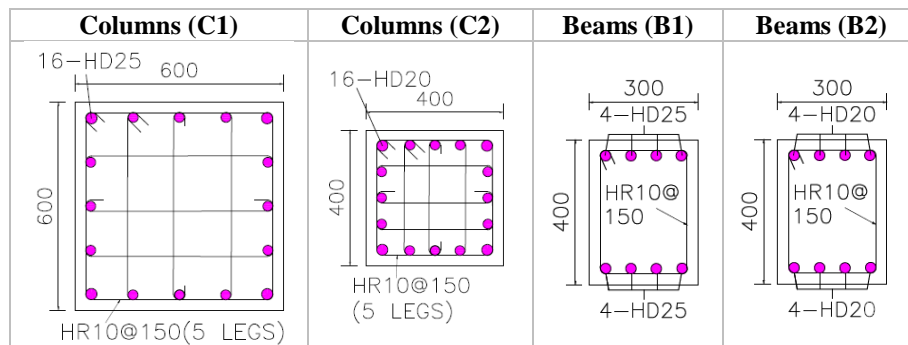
Cross sectional layout of the columns and the beams (all dimensions are in mm)
